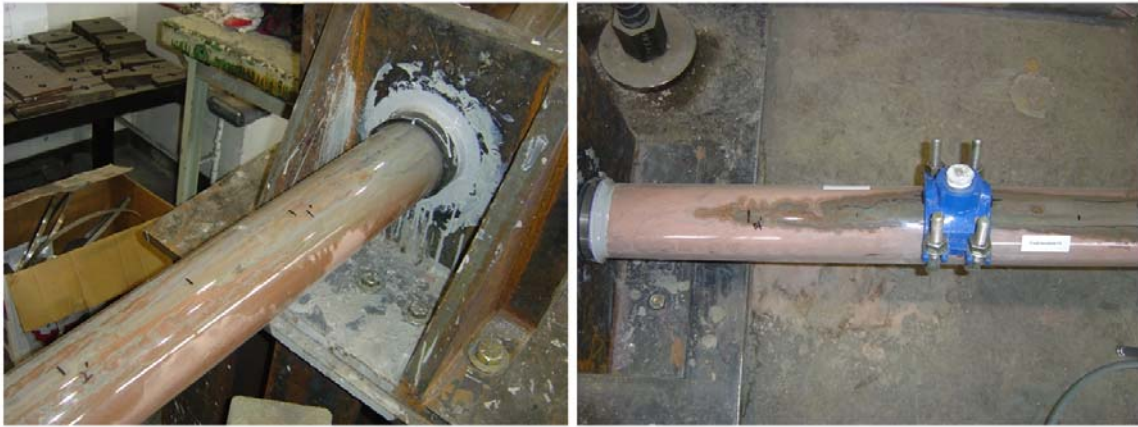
Repair Grouted Ducts of Specimen PVG-C2-2.
